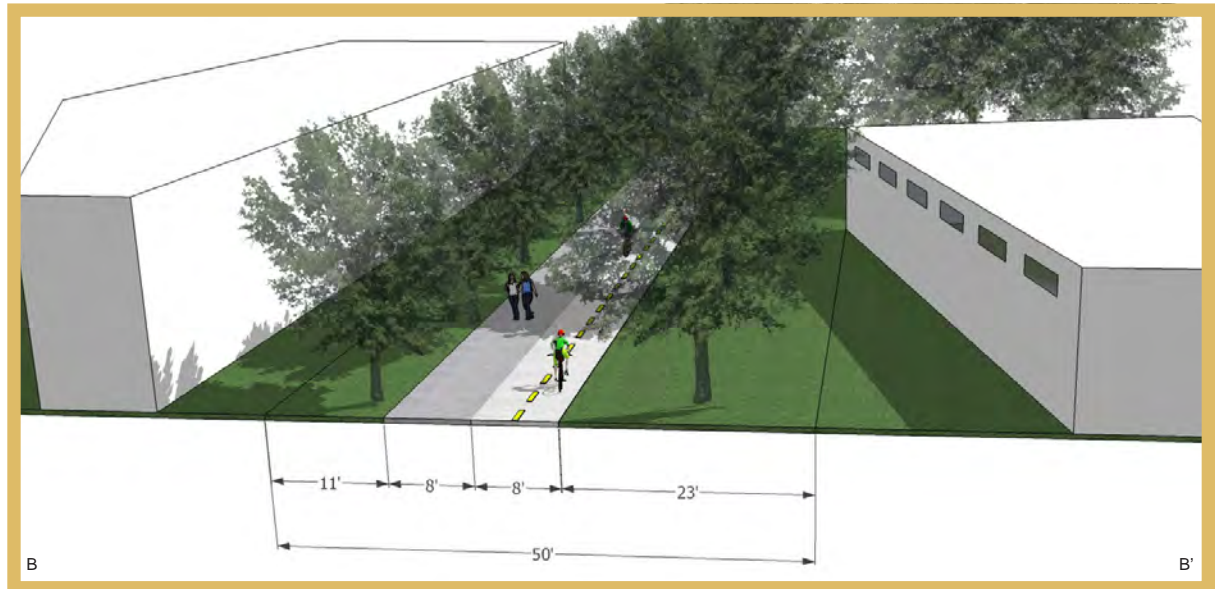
Section ② Proposed Rail-Trail + Trail-Oriented Development
